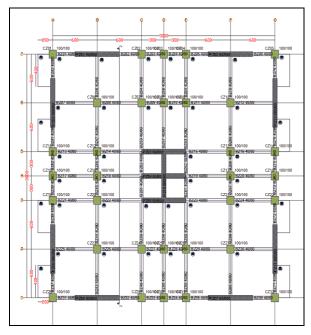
Typical floor plan of the building without support braced system (Model 1) (Units are cm).
